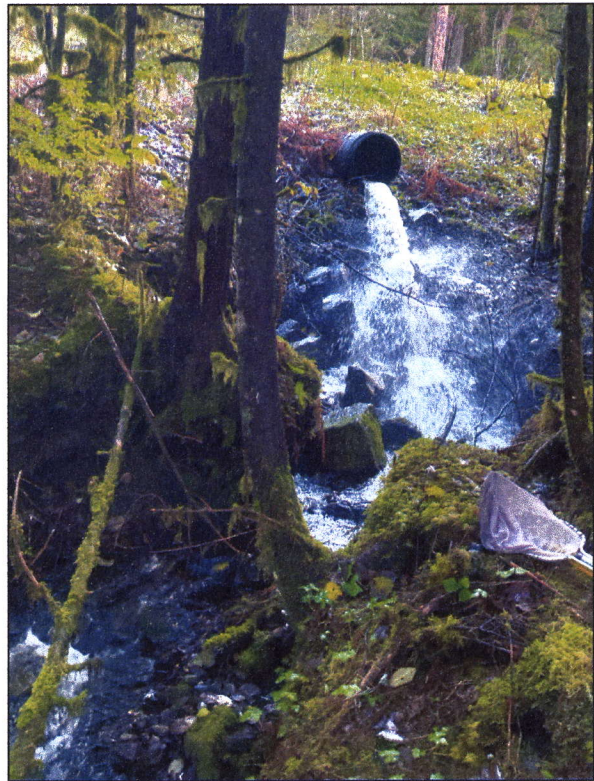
Perched culvert outlet and conveyance stream at waypoint 1028.
